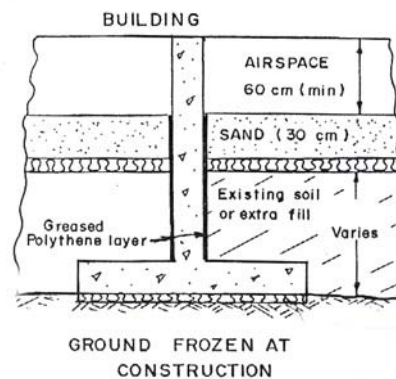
Geotechnical recommendations for Visitor Centre footing.
